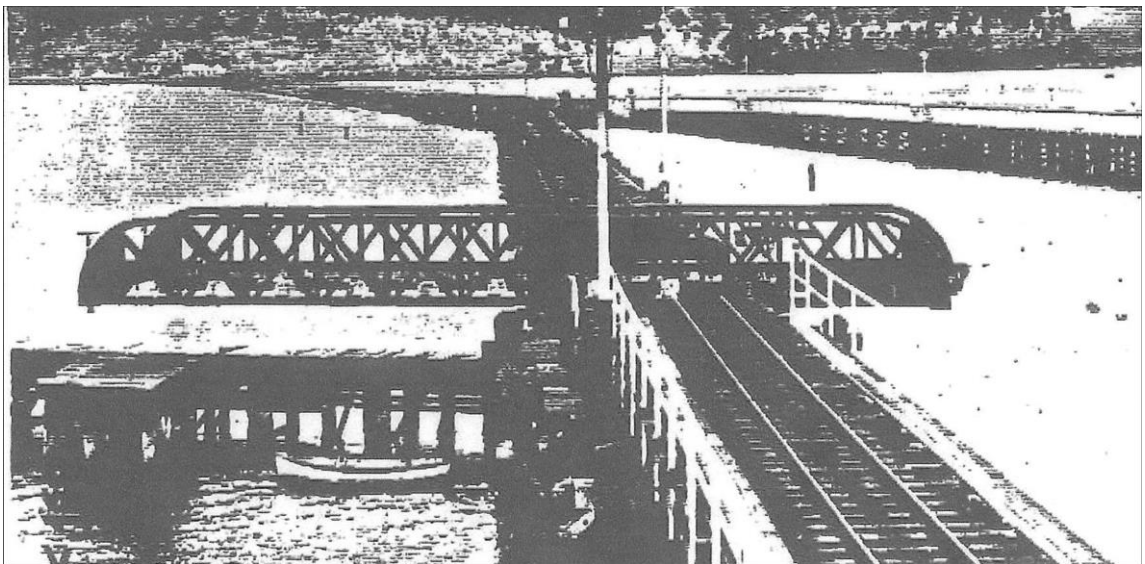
Bridge No2 showing asymmetrical span of the rail bridge opened and also showing part of the 1893 road bridge on the right [Tasmanian Mail 18/01/1908 edited]
